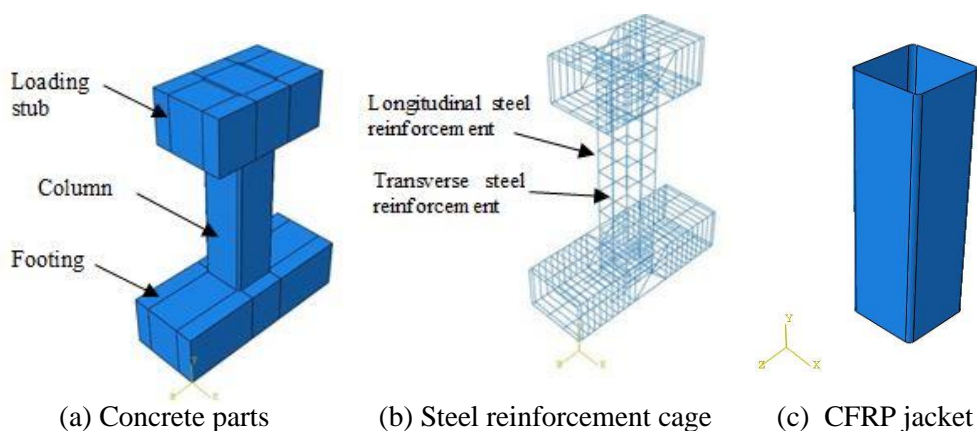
Description of concrete (C3D8R elements), steel reinforcement (T3D2 elements), and CFRP jacket (S4R element) parts assembled in the finite element model
